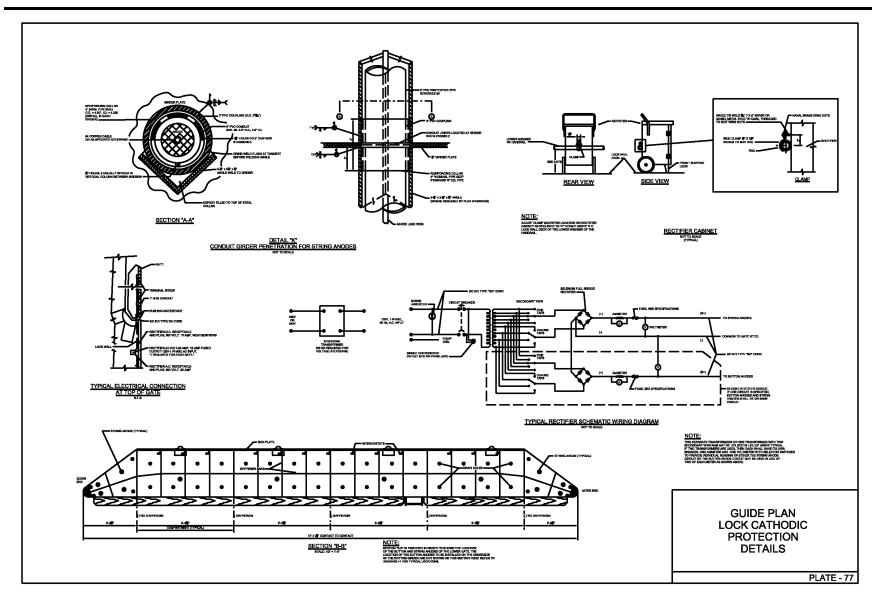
Plate 77: Guide plan, lock cathodic protection details
